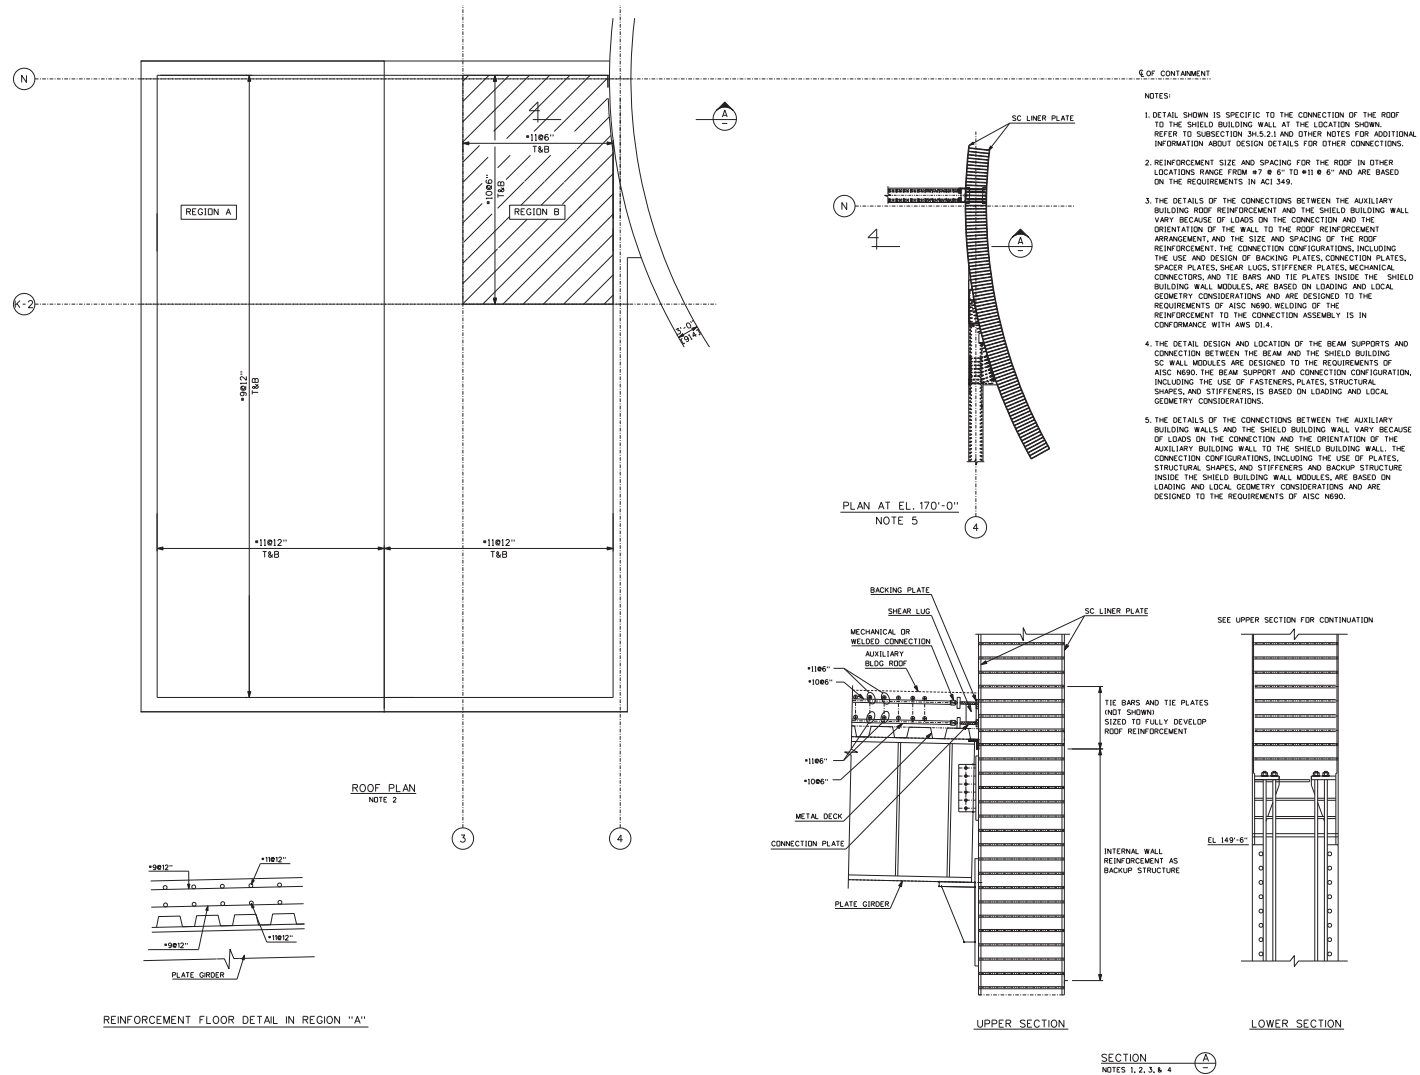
H.5-7 [Typical Reinforcement and Connection to Shield Building]
